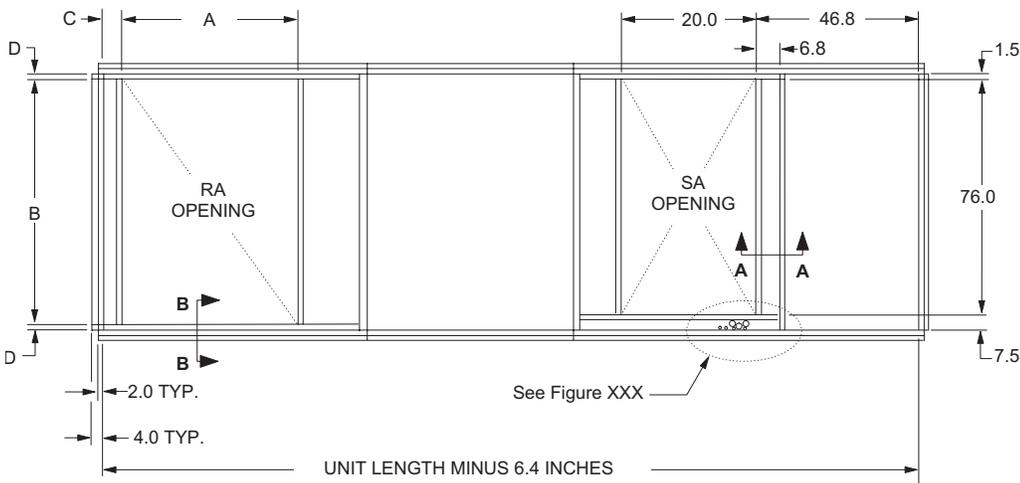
Roof Curb without Blank Compartment (Out of Airstream)
